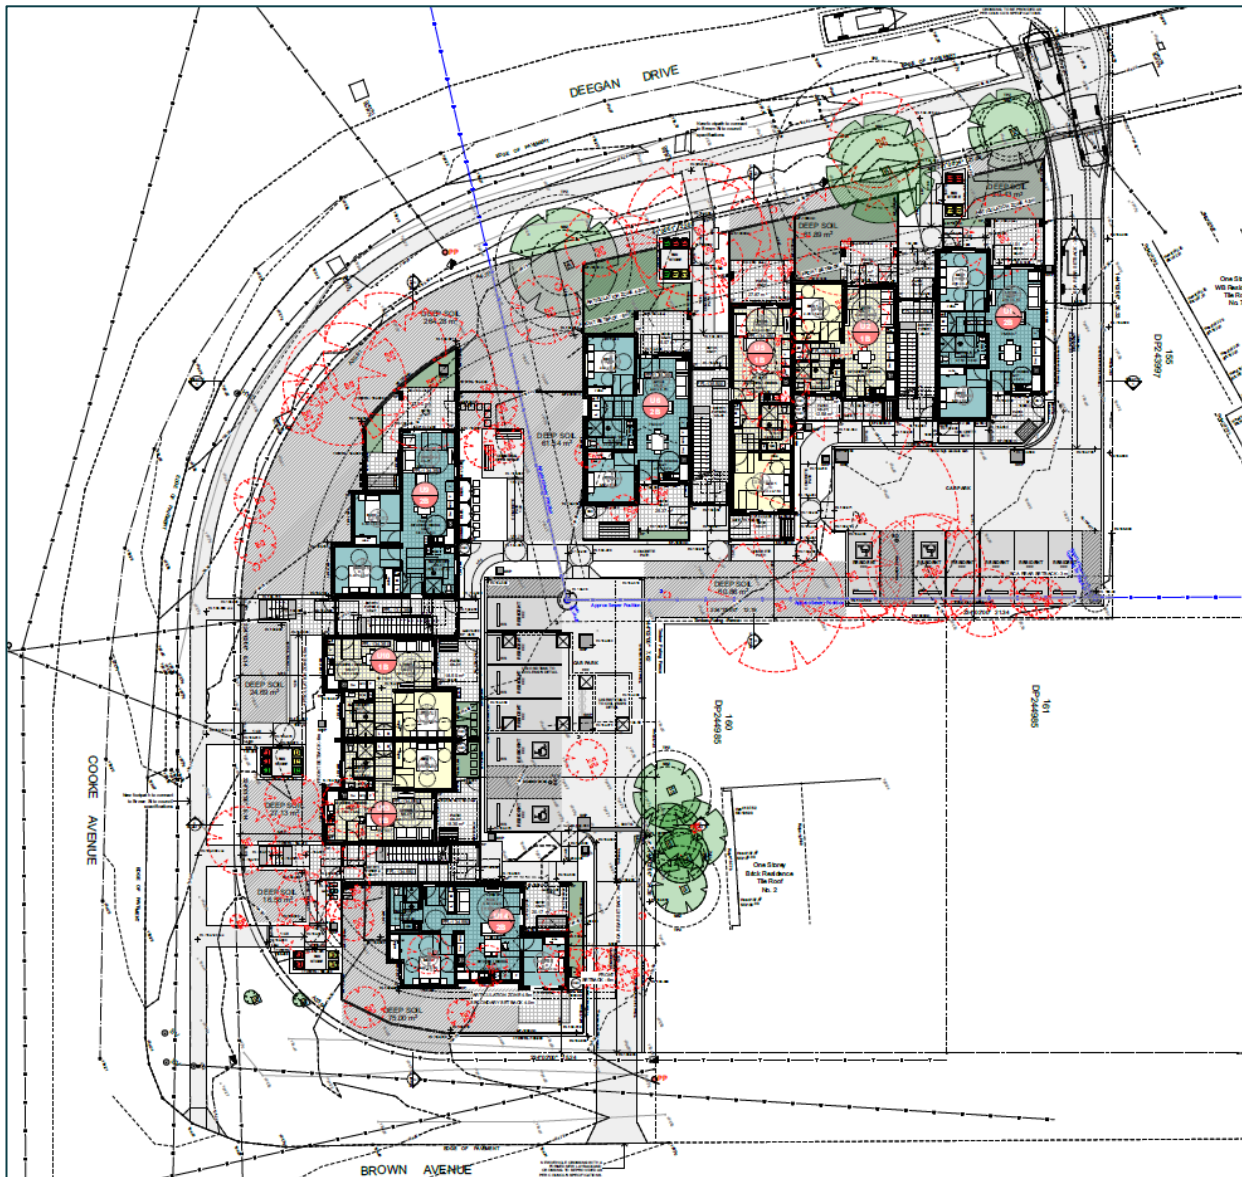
Extract from Architectural Plans - Site and Ground Floor Plan (Source - DTA Architects 2023)
